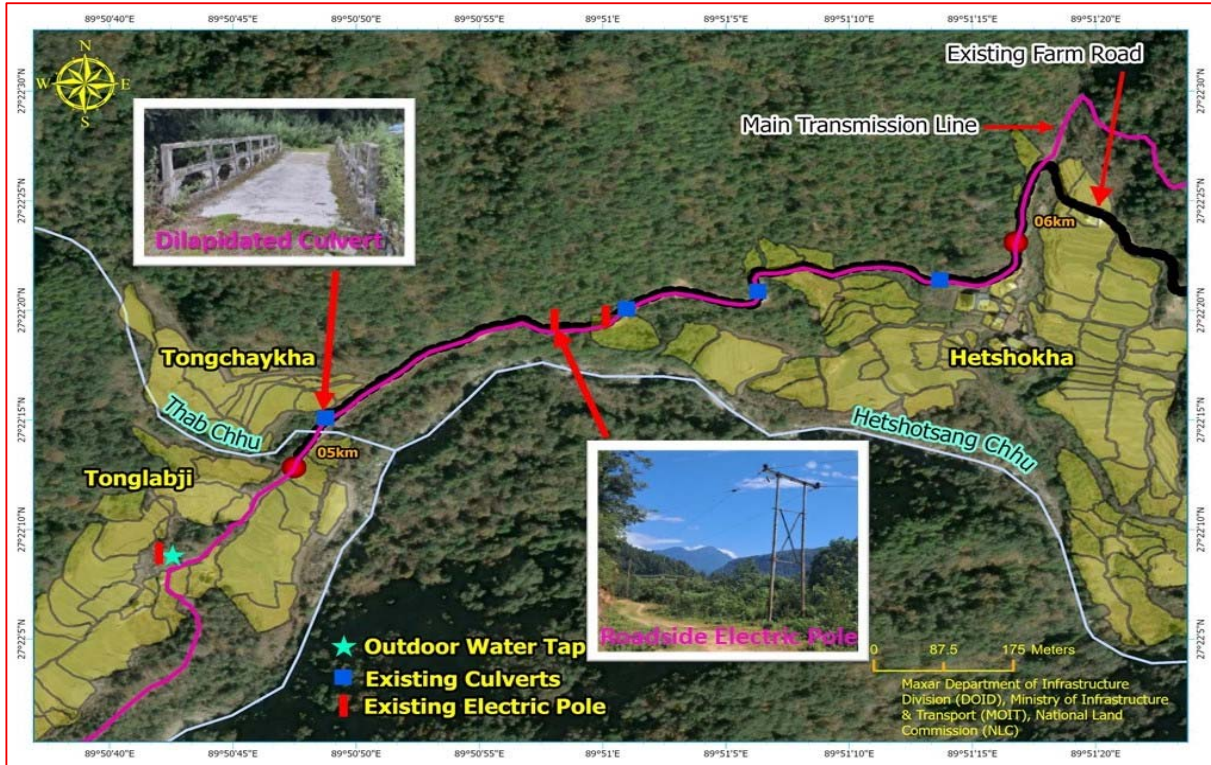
Photographs of Utilities and Culvert over Thab Chhu stream that are likely to be damaged during excavation works (Source: Field survey, October 2025)
